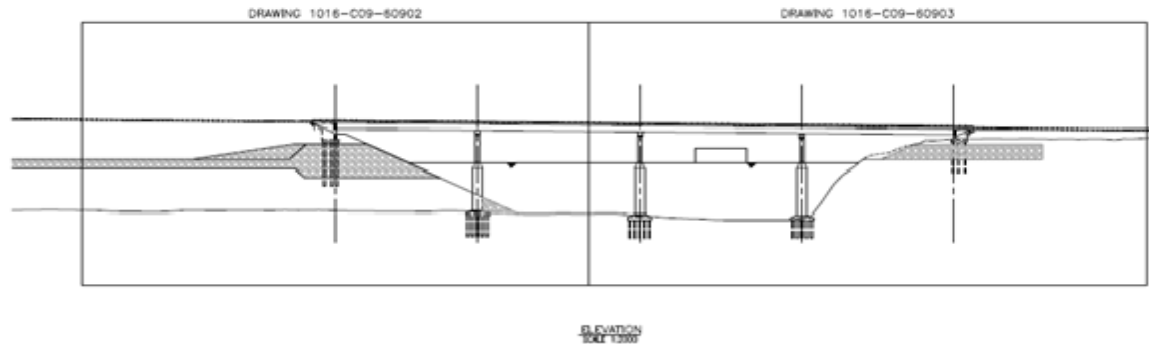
Profile of Halfway River Bridge, per proposed modified design (not to scale)
